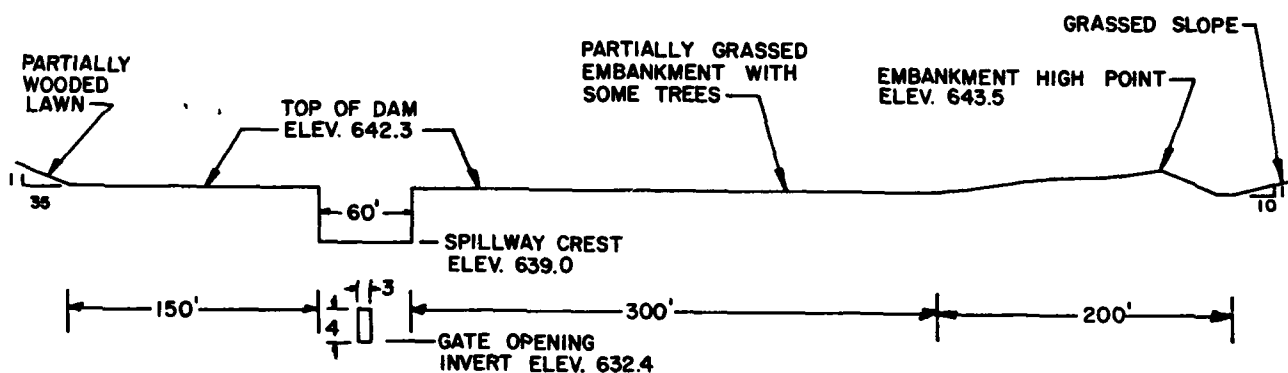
DETAILS FROM DESIGN PLANS AND FIELD INSPECTION NOV. 6, 1979
